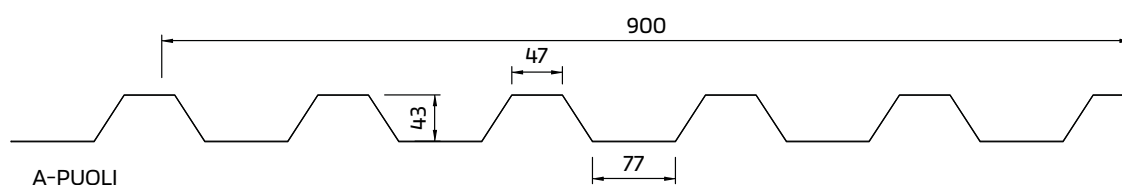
Dimensions according to SFS EN-508-1 tolerances.
